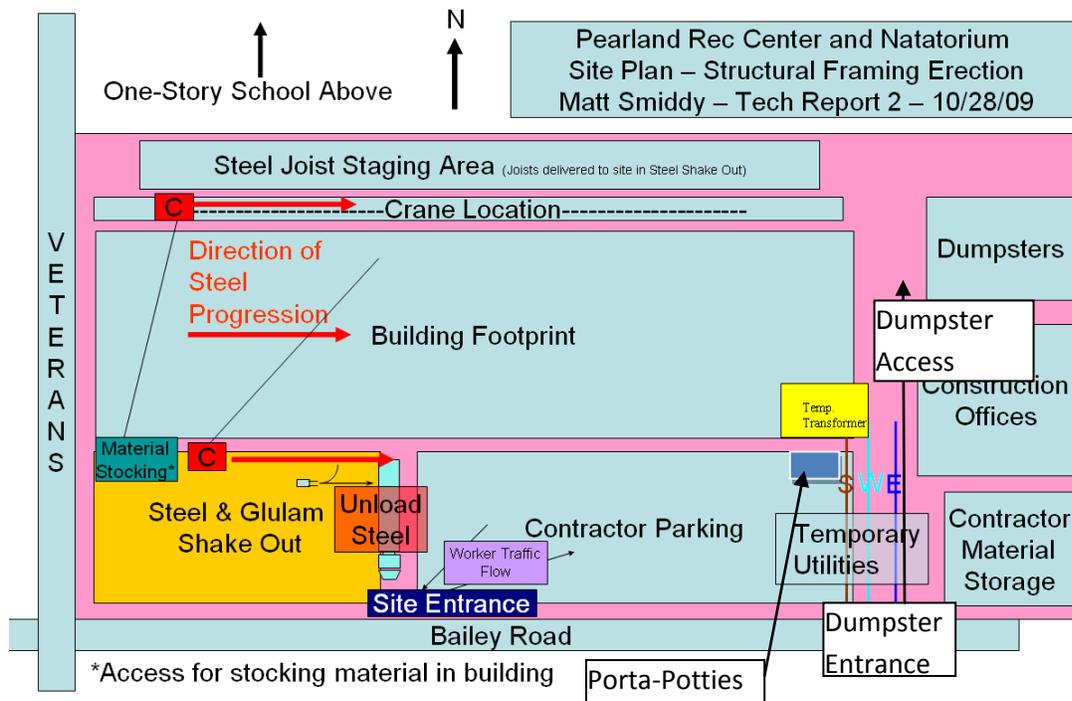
Structural Framing Erection Phase Site Plan
